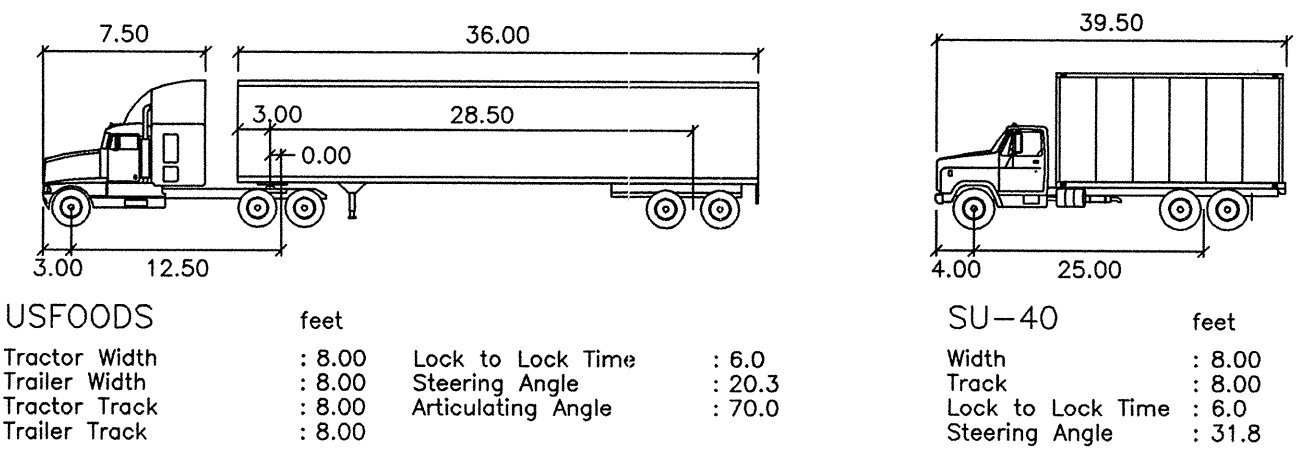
BUILDING 2C LOADING DOCK ACCESS (US FOODS)
